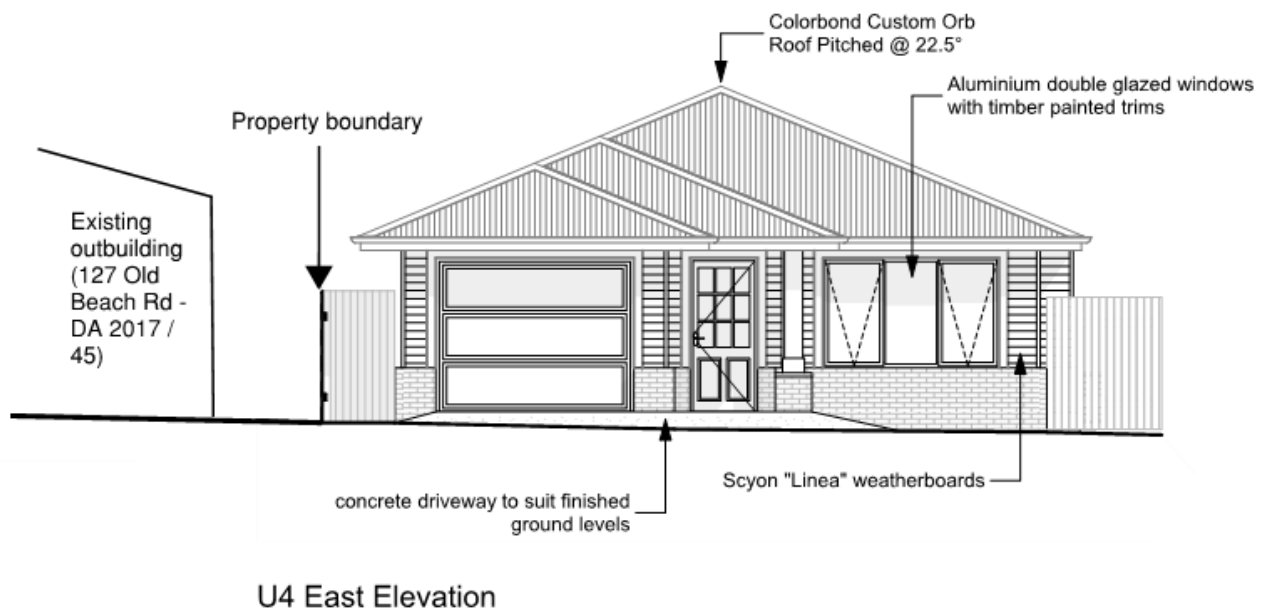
To-scale representation of existing outbuilding at 127 Old Beach Rd (modified by author)
